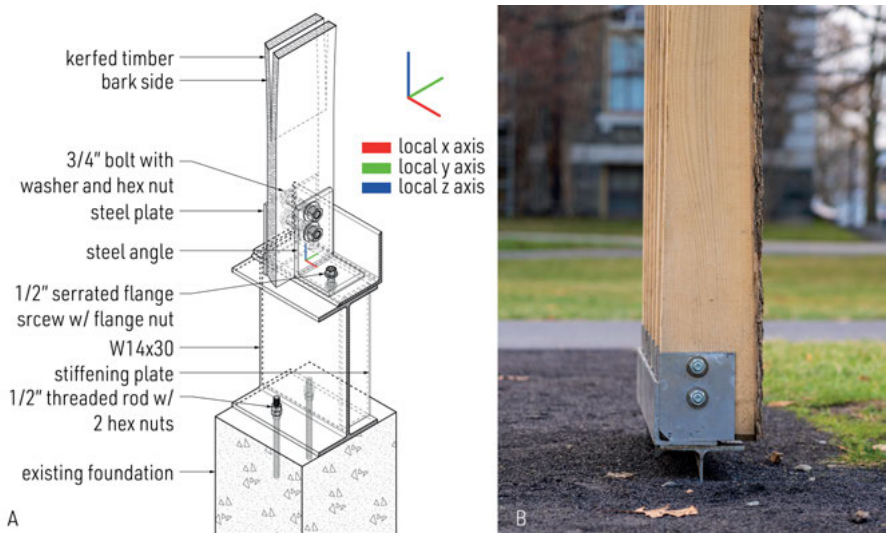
Foundation Connection: (A) axonometric of foundation detail with support definition; (B) Photo of Ground Connection. (Photo by Cynthia Kuo)
